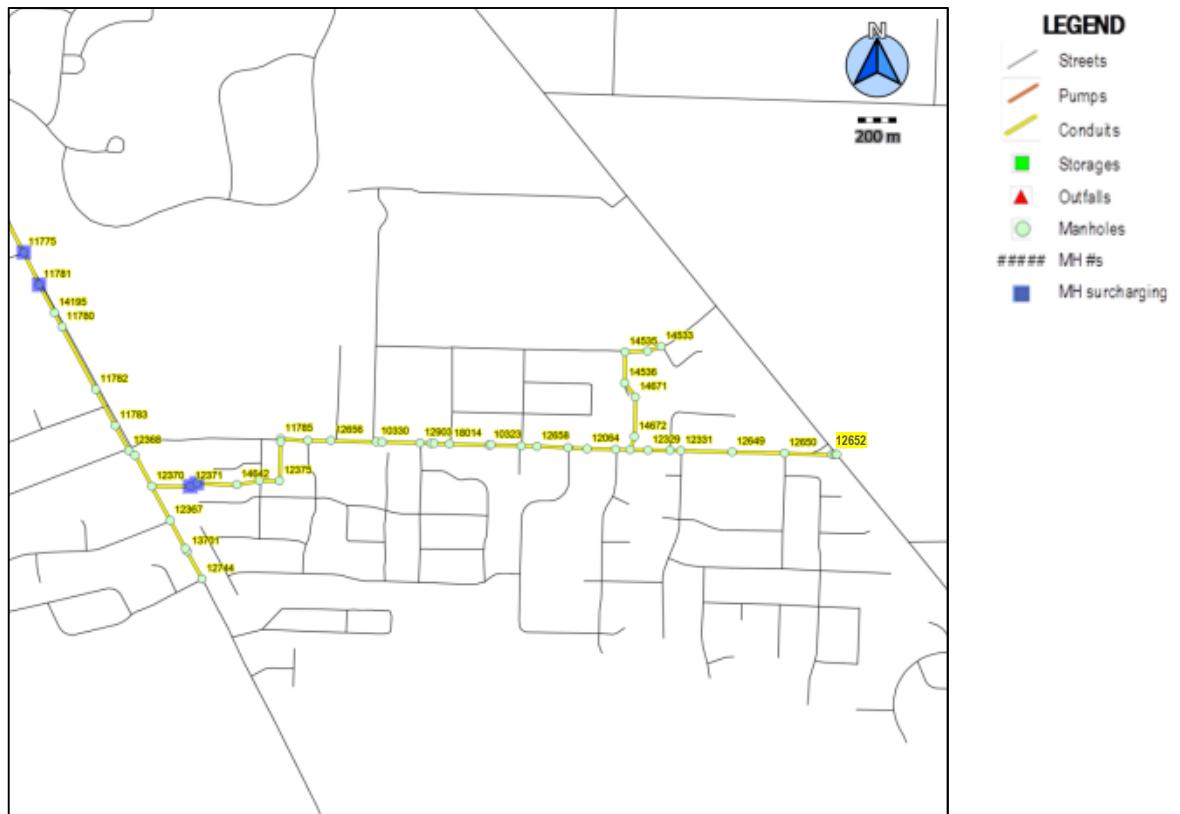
Surcharging (within 5-feet of rim) Along Glen Oak Road – Routing Alternative B
